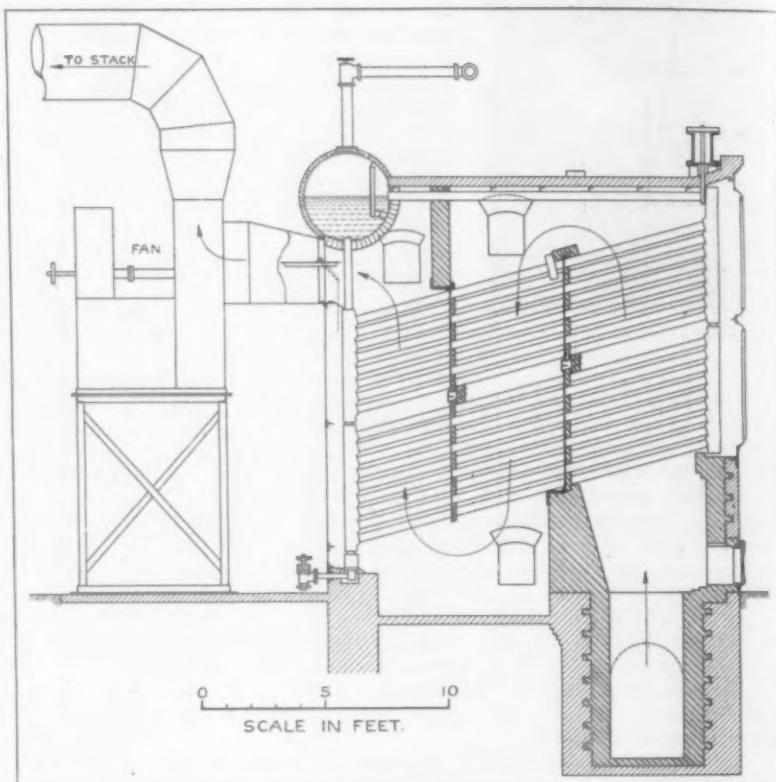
Installation of a Single Boiler Outside the Open-Hearth Building of a Steel Plant in the Chicago District
